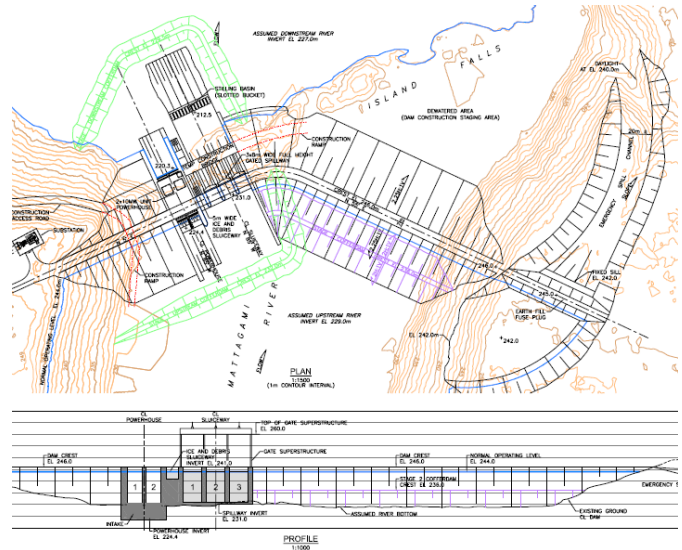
Small power plant under construction: two units each 10 MW. Hydraulic should be verified.
